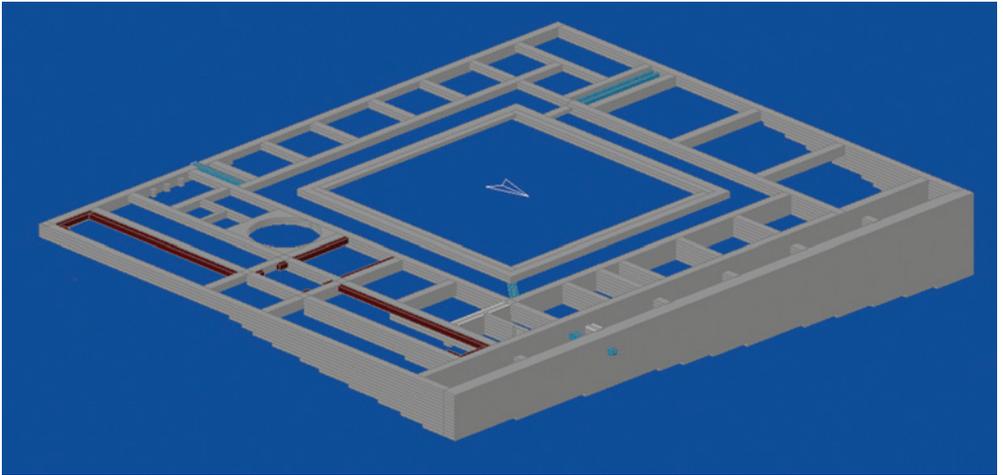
Ground plan showing the foundations of the palace, Aegae.
